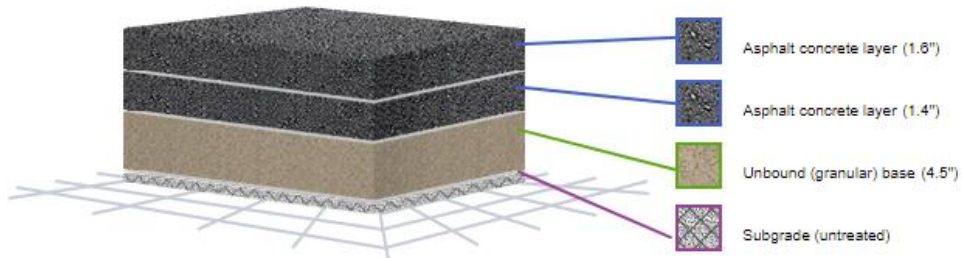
Pavement Structure for MN-1016 Section (Source:InfoPave).
